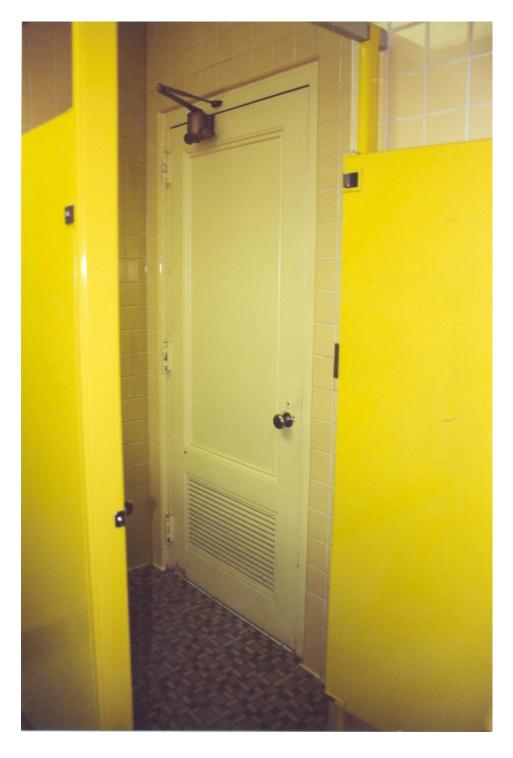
Room 013 – women employees' rest room: south wall, doorway D018 (2001).
